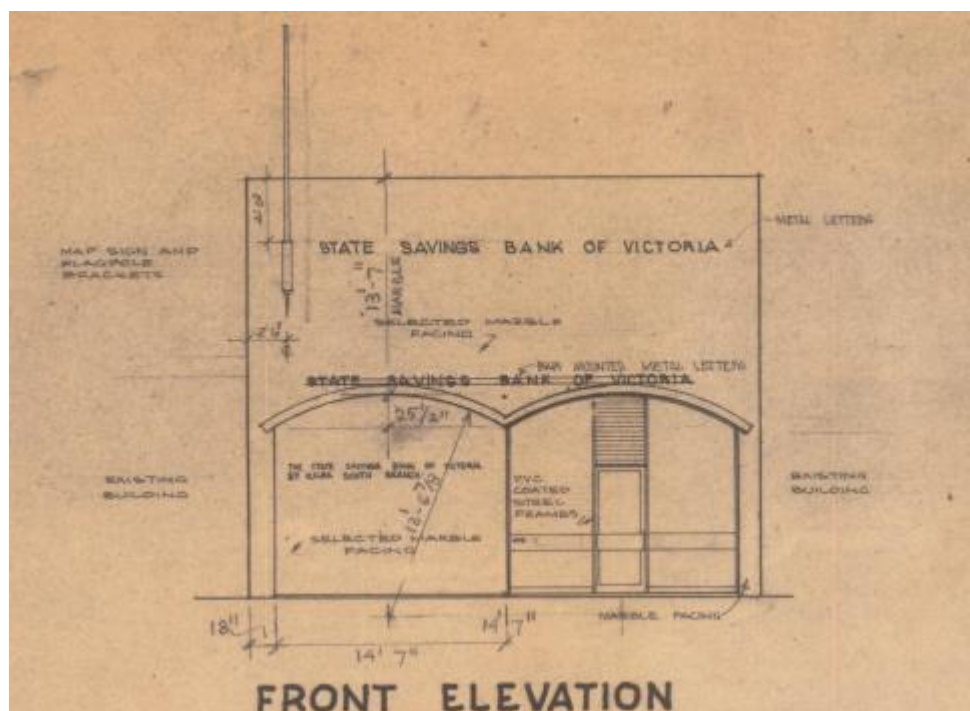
Elevation plan prepared by Best Overend. (Source: Council building file)
